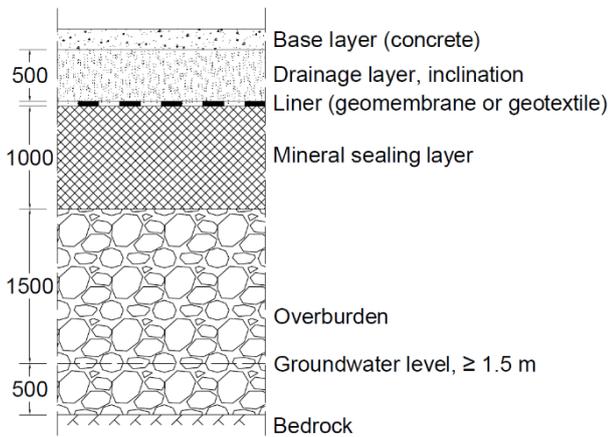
Cross-section of the foundation structures (see Table 9-2). Dimensions are in millimetres.
